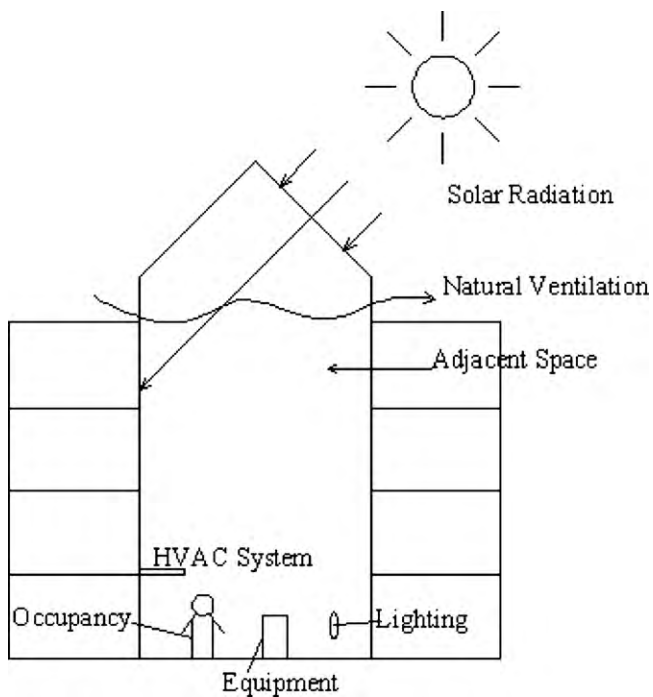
Schematic of atrium buildings with daylight glazing roof.
